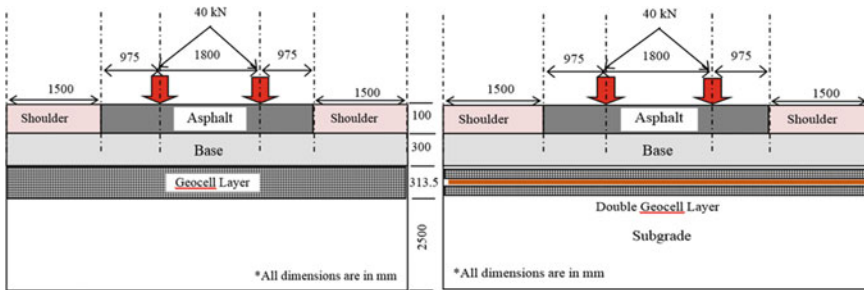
Pavement structure with a single- and b double-layer geocell reinforcement
